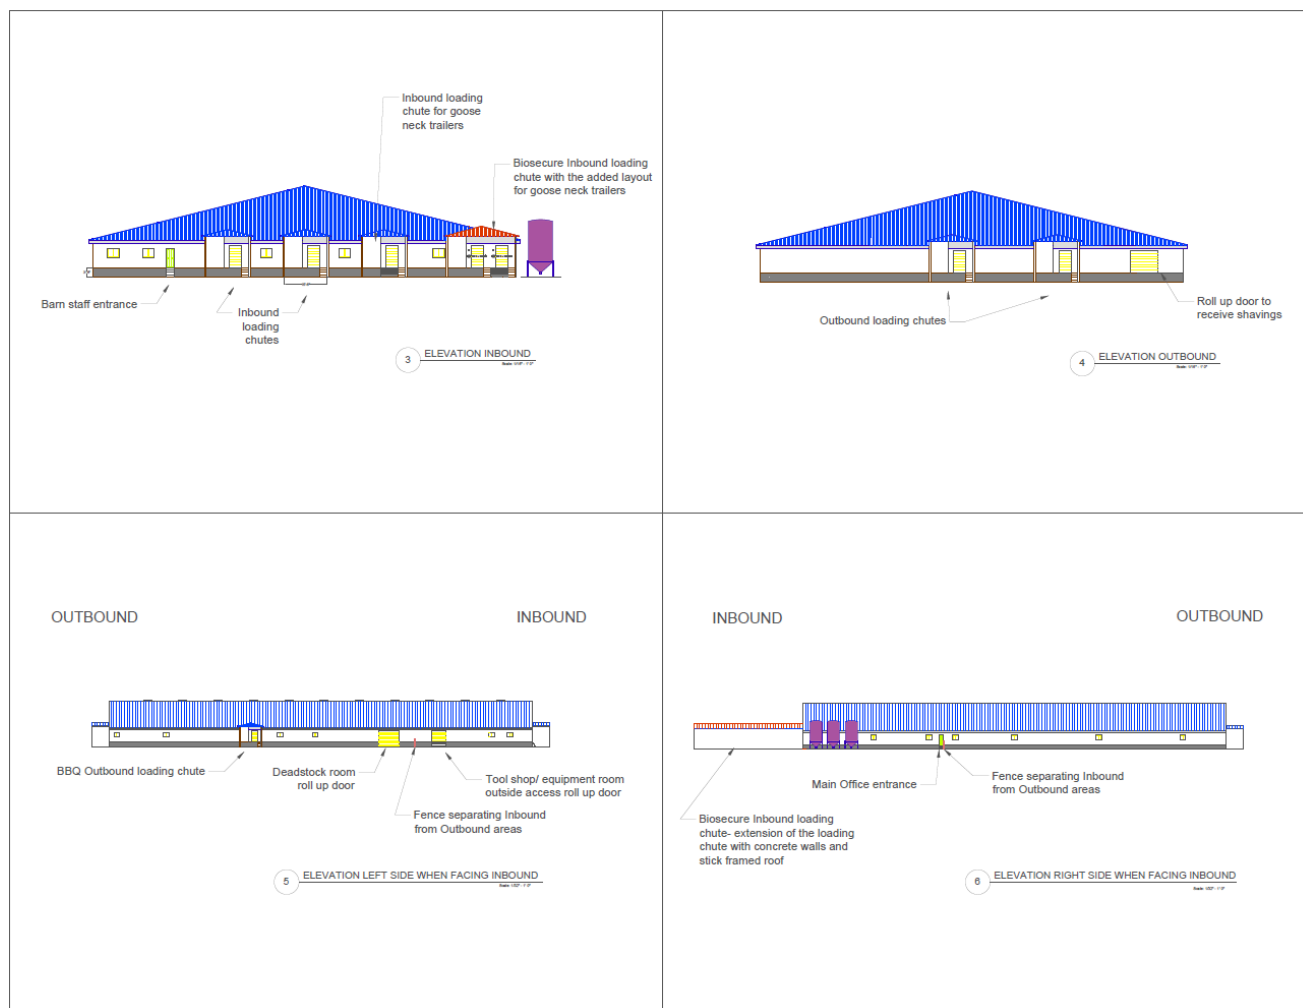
EXTERIOR VIEWS OF THE ASSEMBLY
